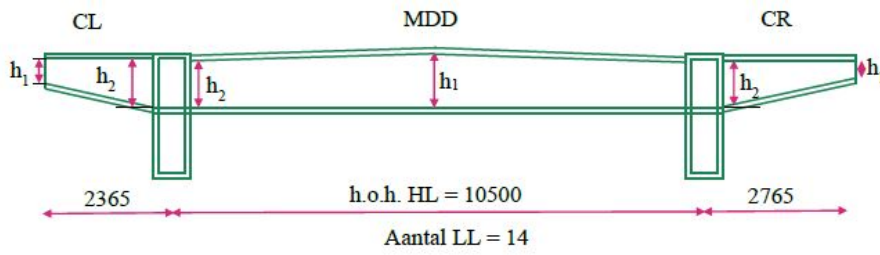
Measurements of the cross girders (Arup bv) MDD = CCG (Center Cross Girder)
